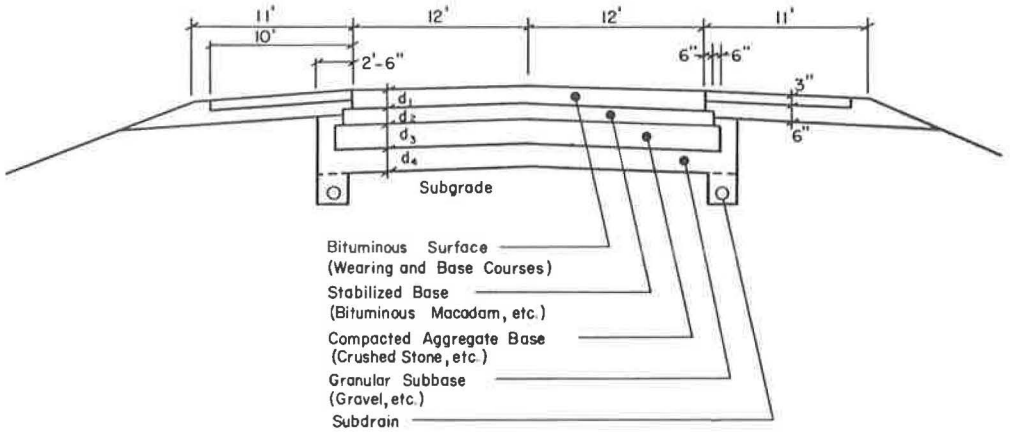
Typical cross section of a flexible pavement with subbase and drain for a two-lane highway.
